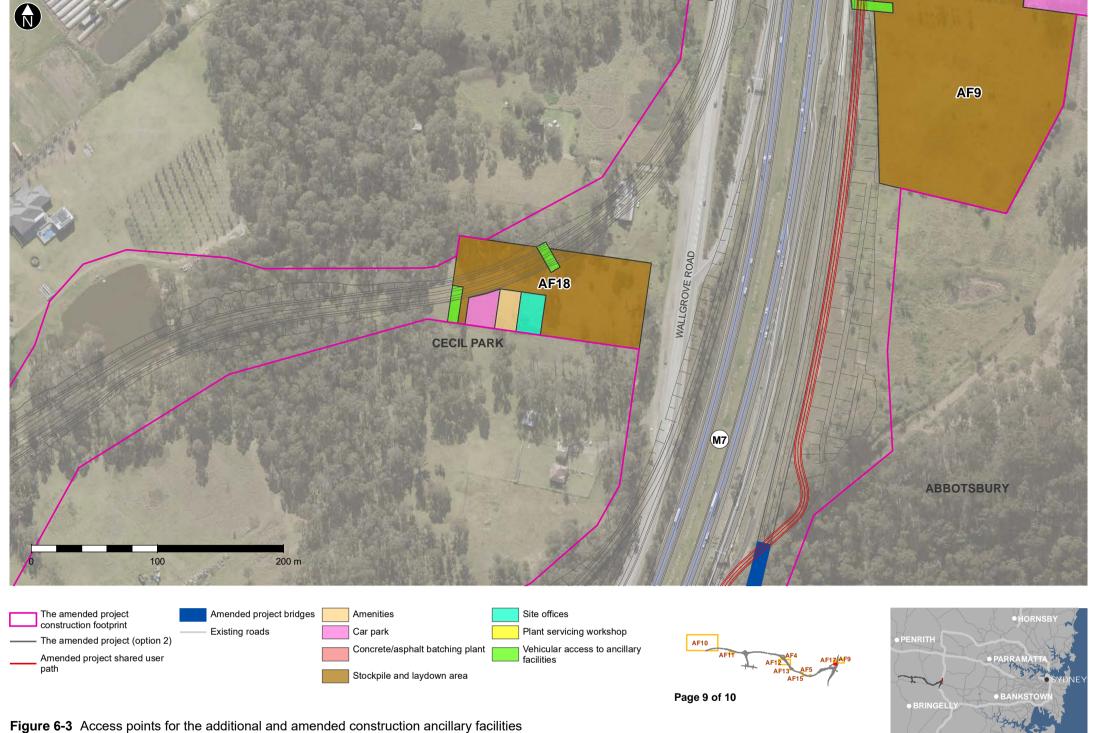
Access points for the additional and amended construction ancillary facilities
